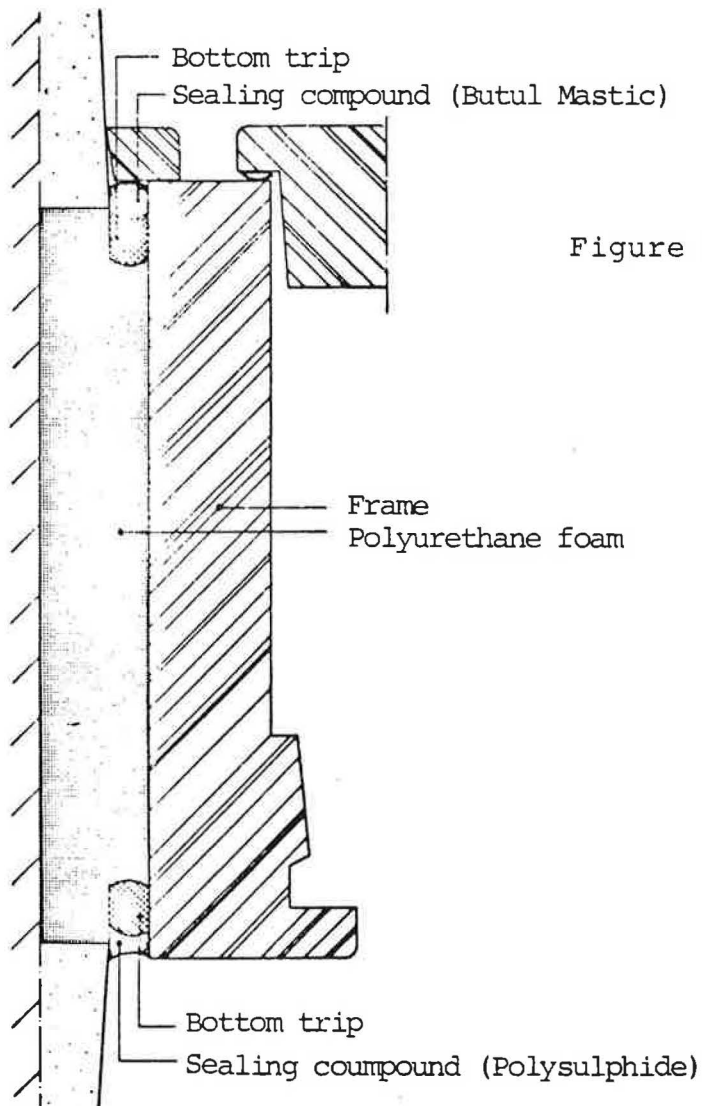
Sealing the window jamb joints to outside wall with polyurethane foam. Horizontal section.
